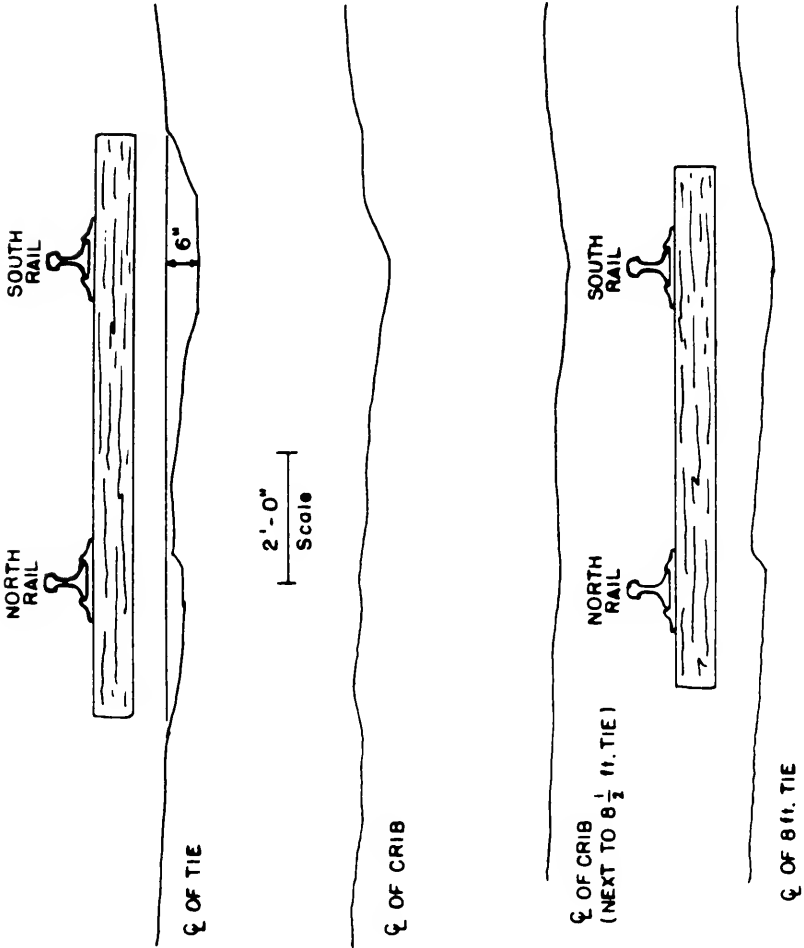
Transverse Subgrade Profiles at Four Locations in Test Section 3.
